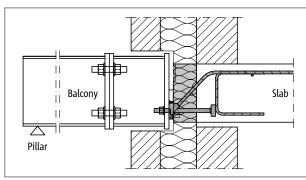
Schöck Isokorb[®] T type SQ: Insulating element within the core insulation zone; steel stub adjuster between the Isokorb[®] and the balcony for flexible construction workflows
